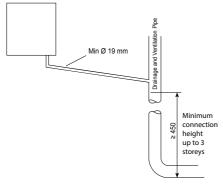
Connection of the Condensate Water Drainage Pipe to Internal Drainage and Ventilation Pipe
